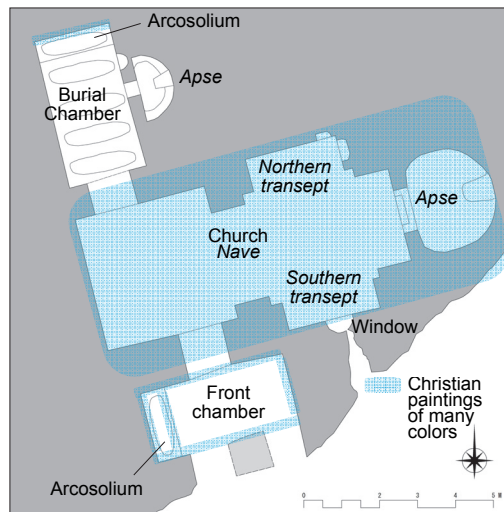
Plan of Yılanlı Kilise (redrawn after [4])
